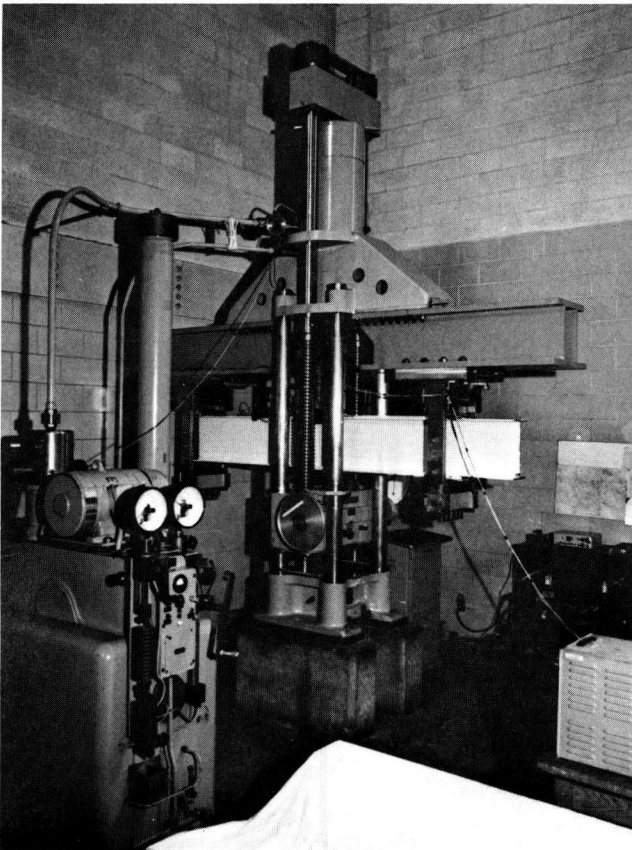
Alternating stress machine used for short span tests at Lehigh.
